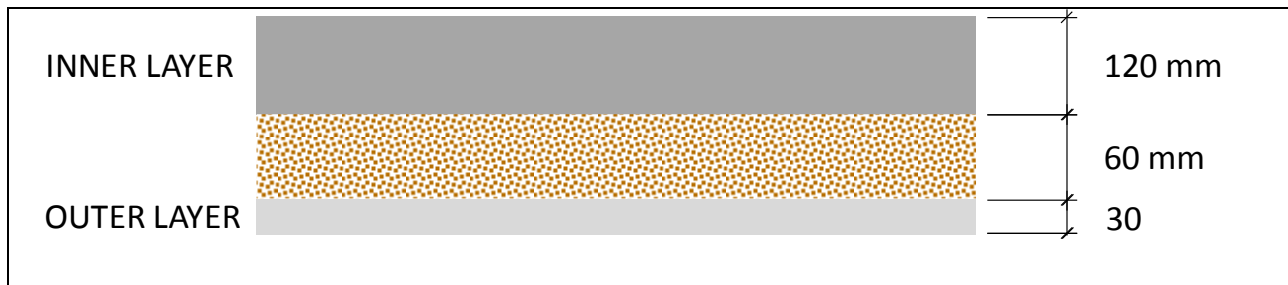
Dimensions of RE<sup>4</sup> concrete façade panel for warm climate
